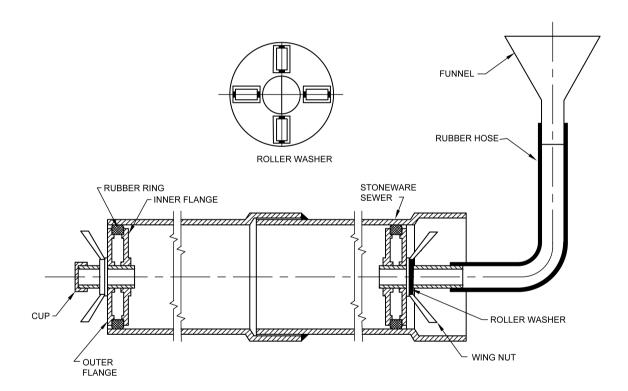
TYPICAL ARRANGEMENT FOR HYDRAULIC TEST OF SEWERS
